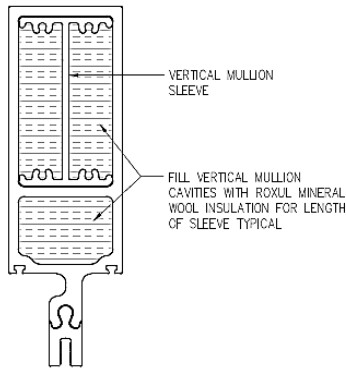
Framing Cross-Section (Top View) with Vertical Mullion Sleeve and Insulation
